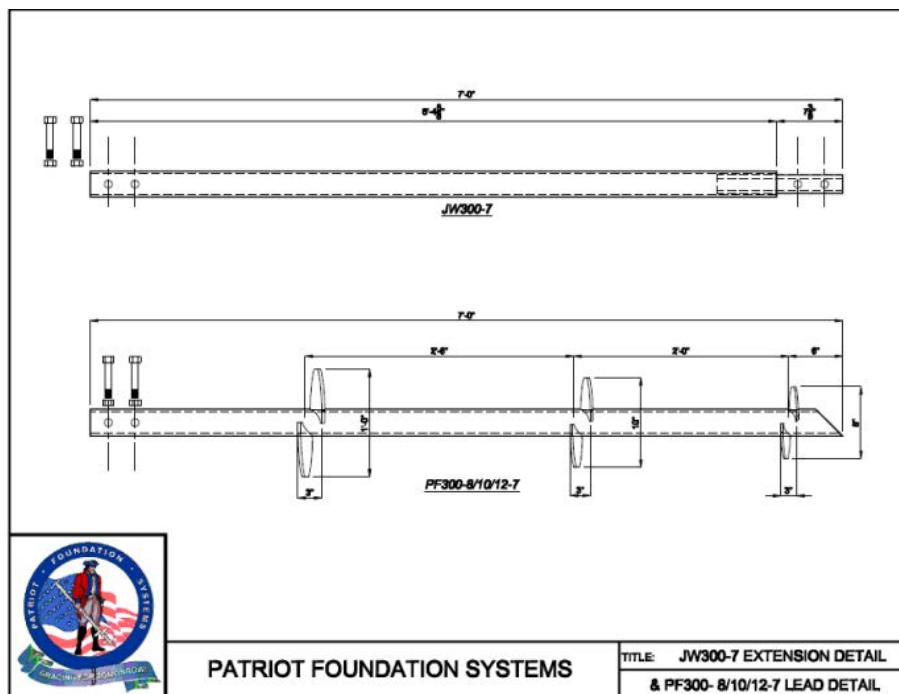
TYPICAL EXTENSION & LEAD DETAIL
